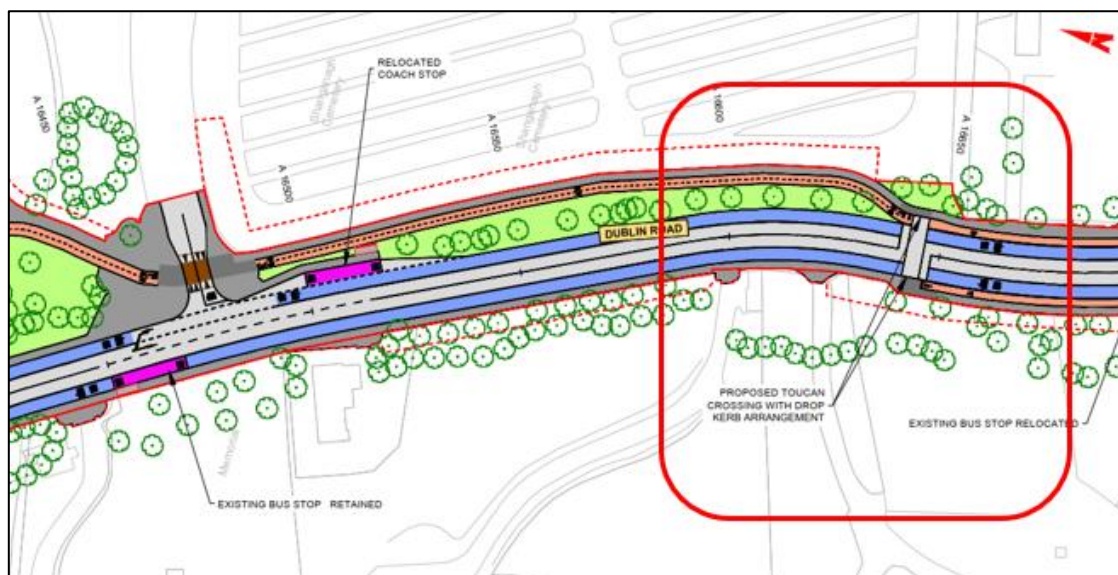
Extract from General Arrangement Drawings showing Proposed Toucan Crossing at Chainage 16+500 (Sheet 47)
